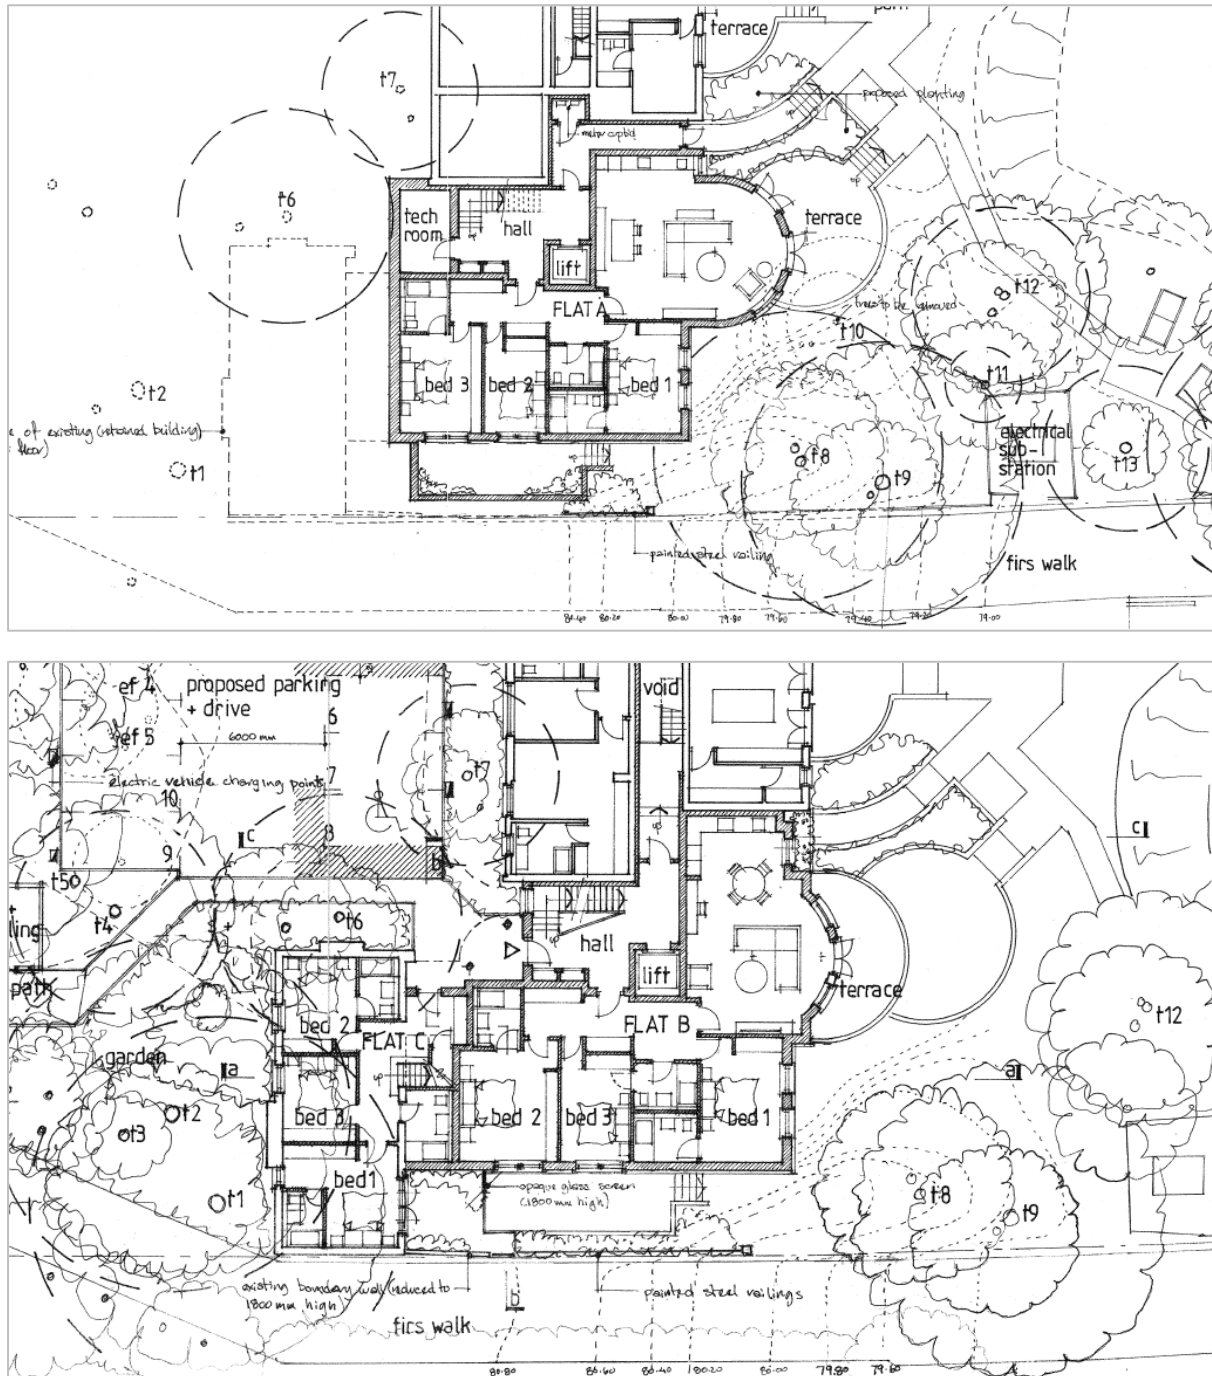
GNP Architects Lower Ground Floor rooms at Flat A (top) and Ground Floor rooms at Flats B and C (bottom).
